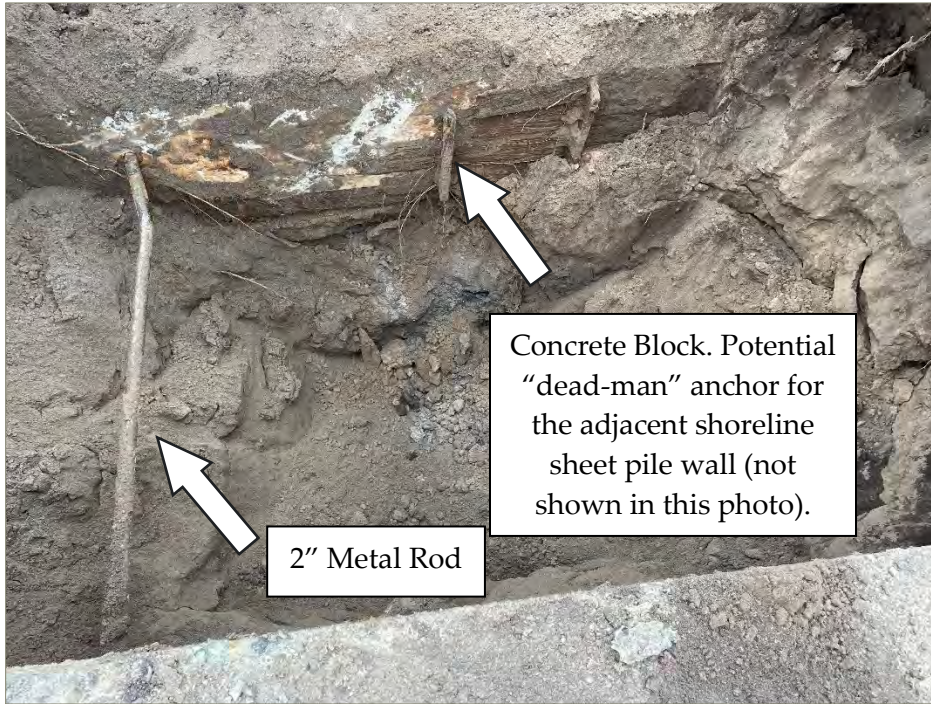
Area 8 – View of the West Half Final Extent of the Excavation. Photo taken on October 5, 2021. View direction is east. A metal rod and concrete block were observed in the excavation and are potential structural components of the adjacent sheet pile wall.
